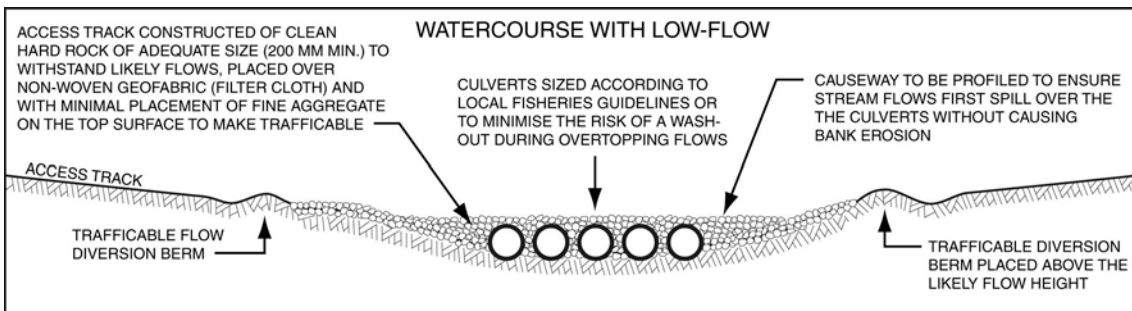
Typical profile of temporary culvert crossing (cross-section)
